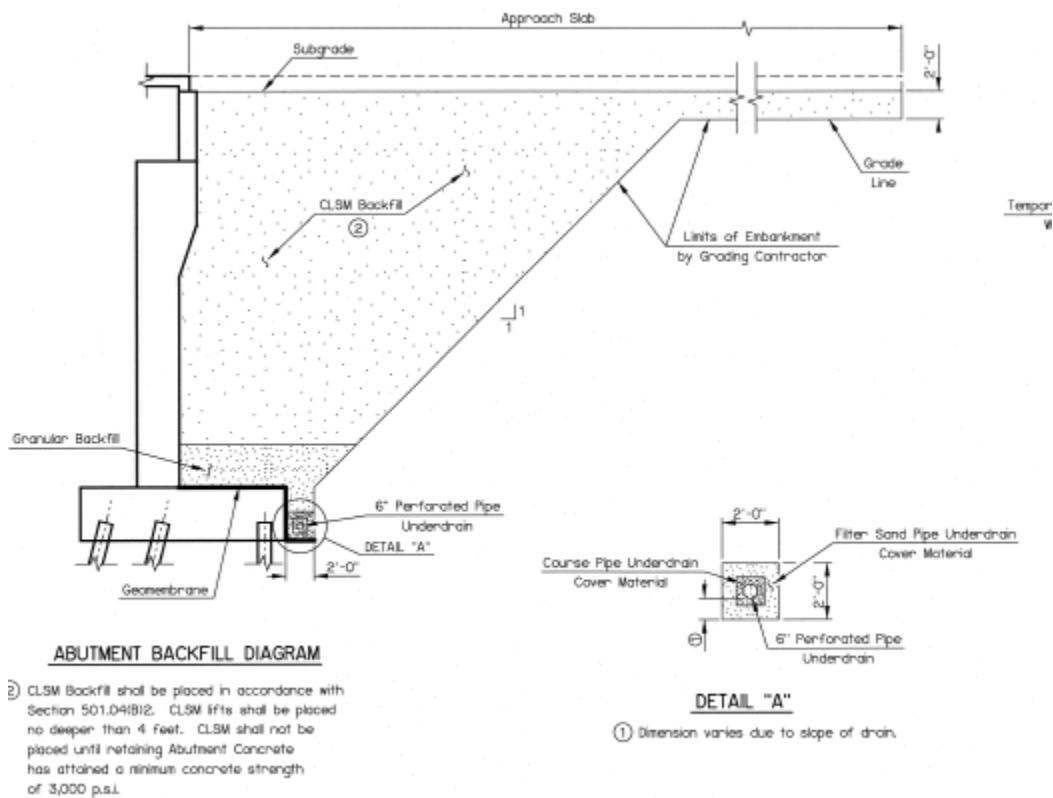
Backfill drainage system for SPUI bridge on Main Street over I-35 in Norman
